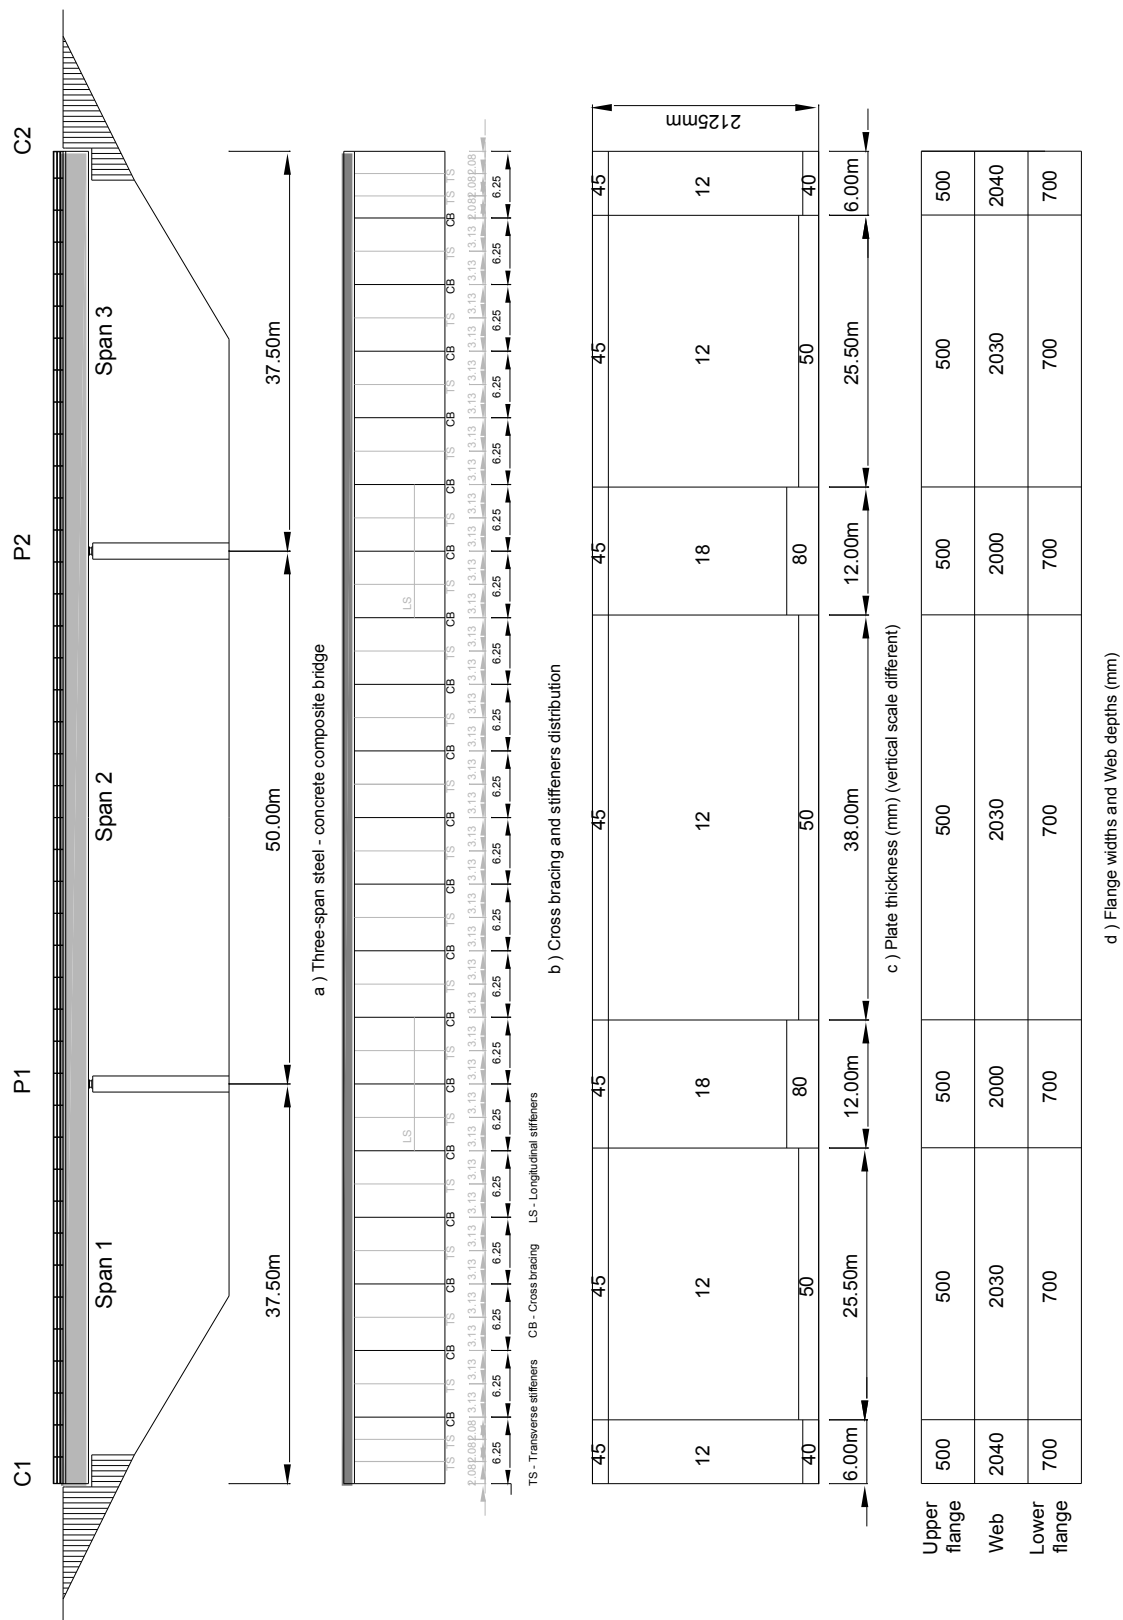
Structural arrangement of the steel-concrete composite bridge
